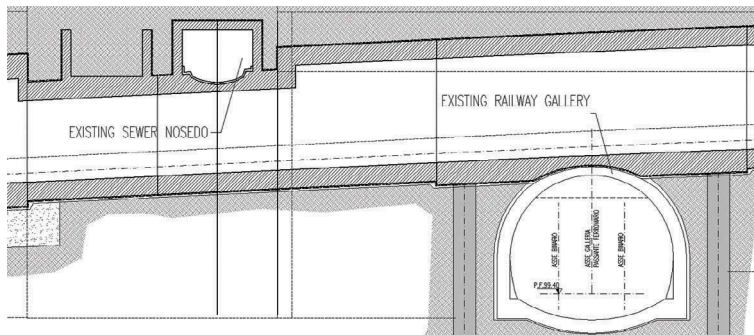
Metro Line 4: longitudinal profile solution “A”. The Nosedo sewage culvert is on the left, while the existing railway tunnel is inside the diaphragms on the right.
